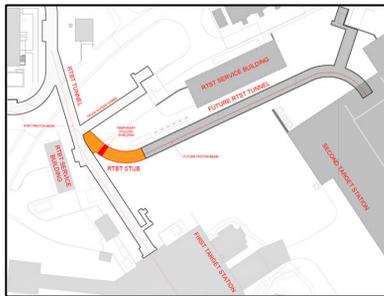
Plan view of the SNS site showing the existing RTBT tunnel, the planned RTBT stub, and the connection to the future Second Target Station.
